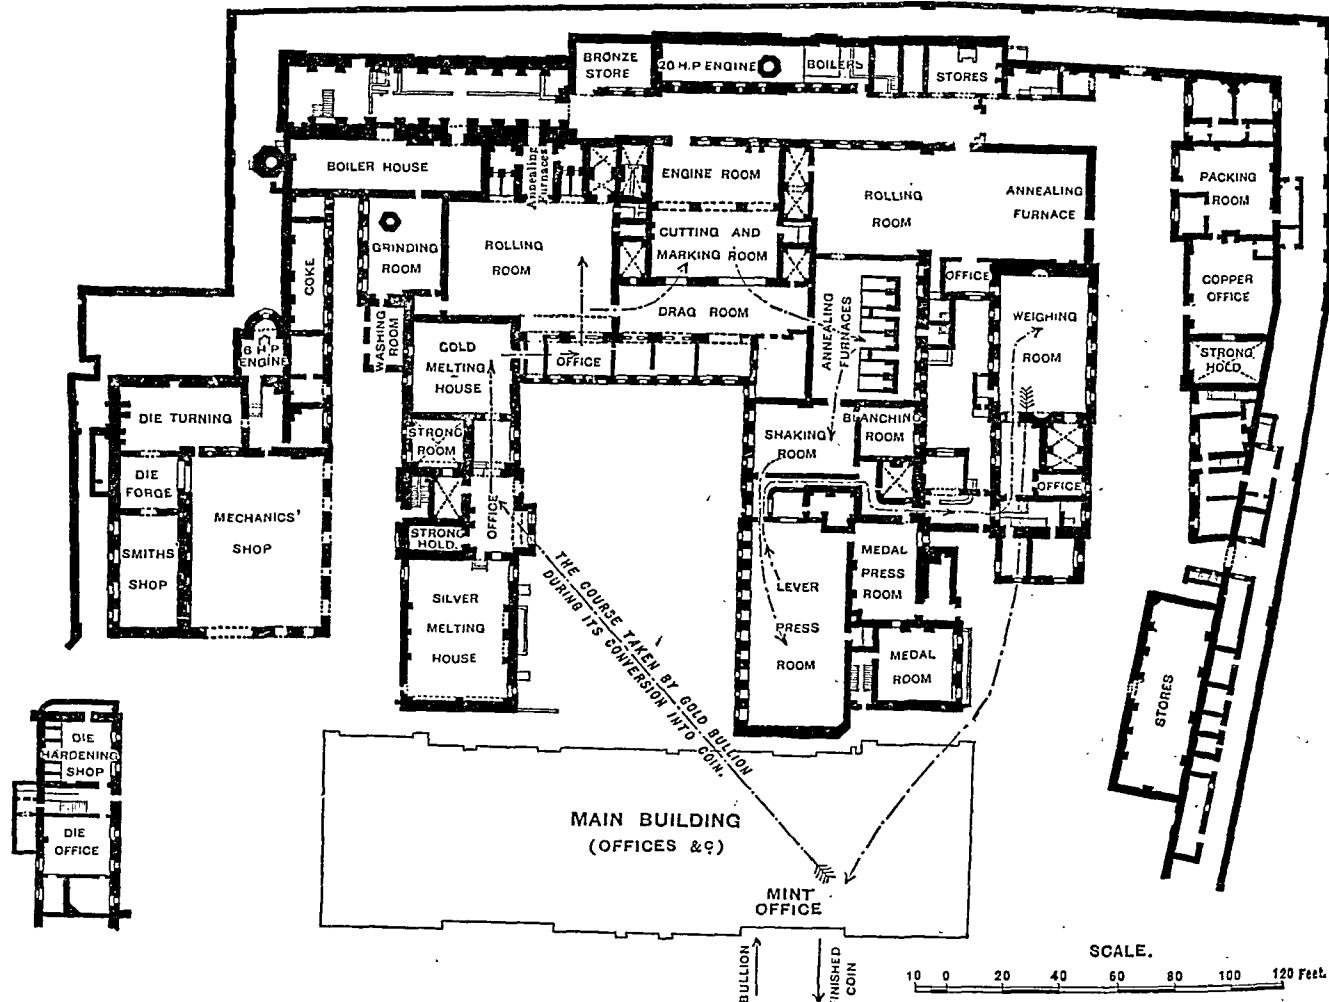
Royal Mint, Tower Hill, London. Plan showing the Operative Department as rearranged in 1881-82.
